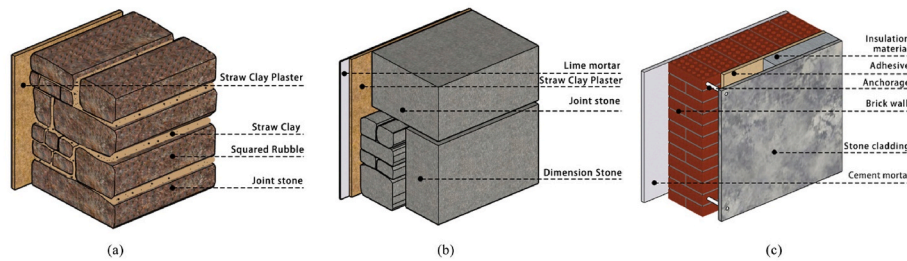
Three kinds of wall construction: (a)rough stone wall, (b)dimension stone wall, (c)stone cladding wall.
